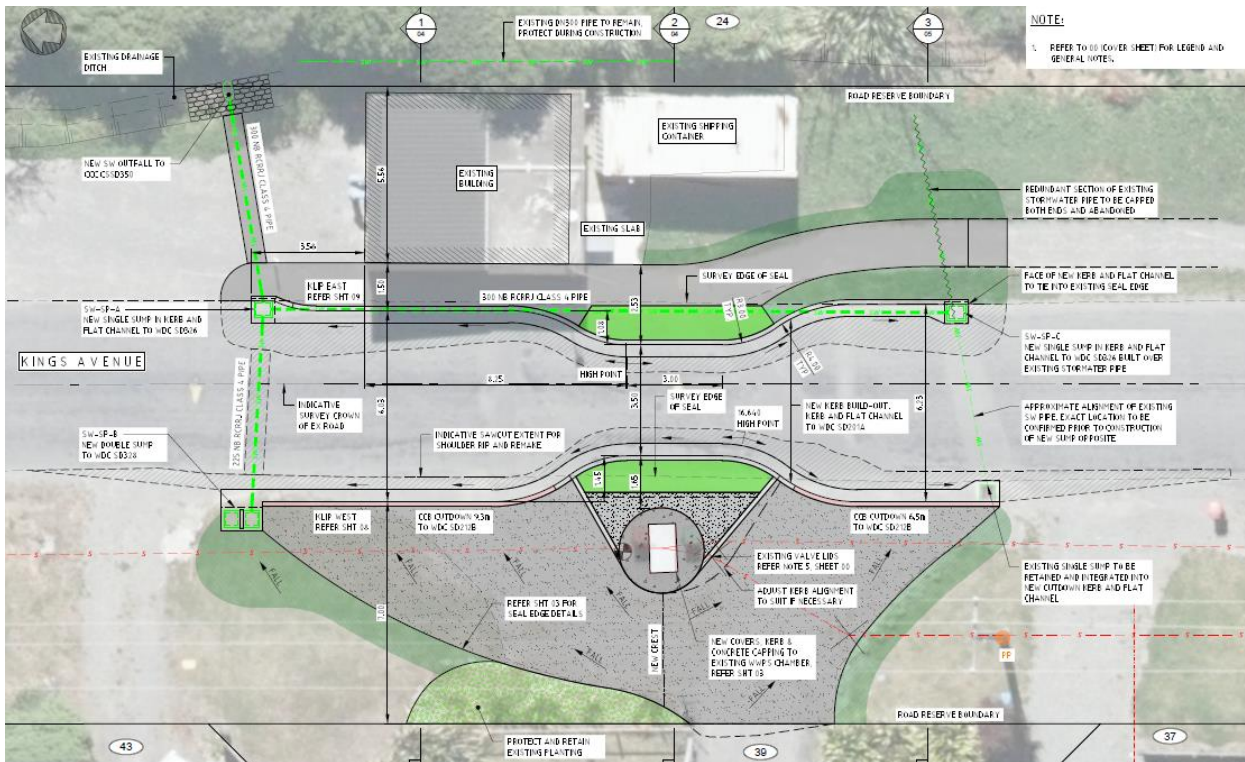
Kings Avenue Wastewater Pump Station Drainage Improvements
